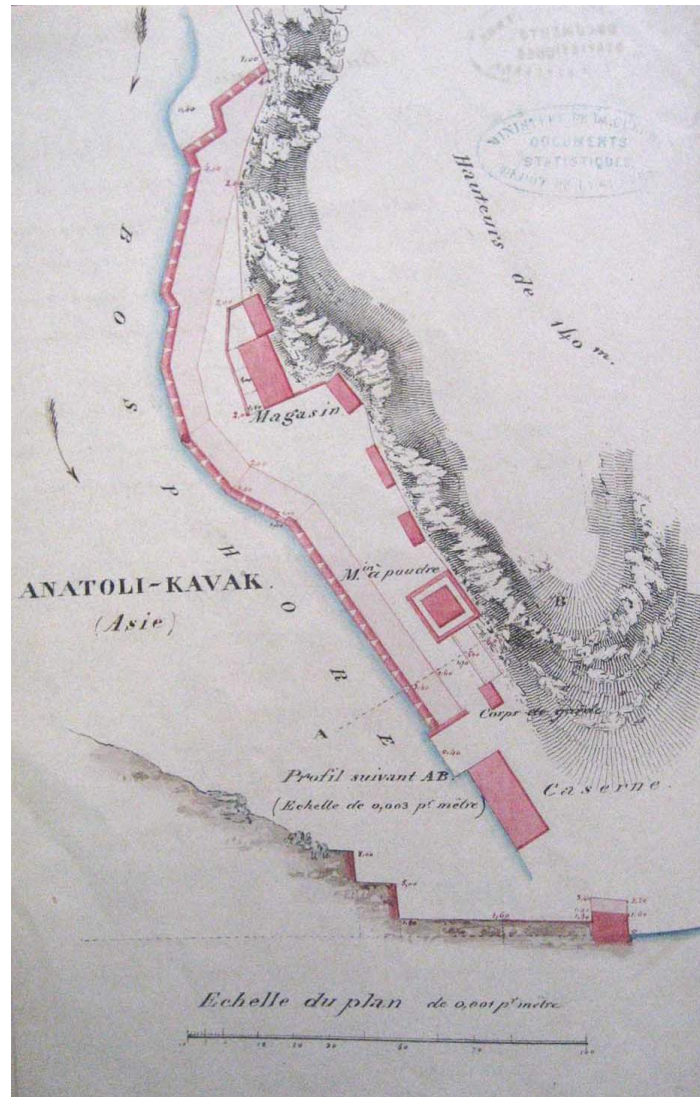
Plan and section of Anadolu Kavak fortress from 1850 (SHAT GR1M.1620)
